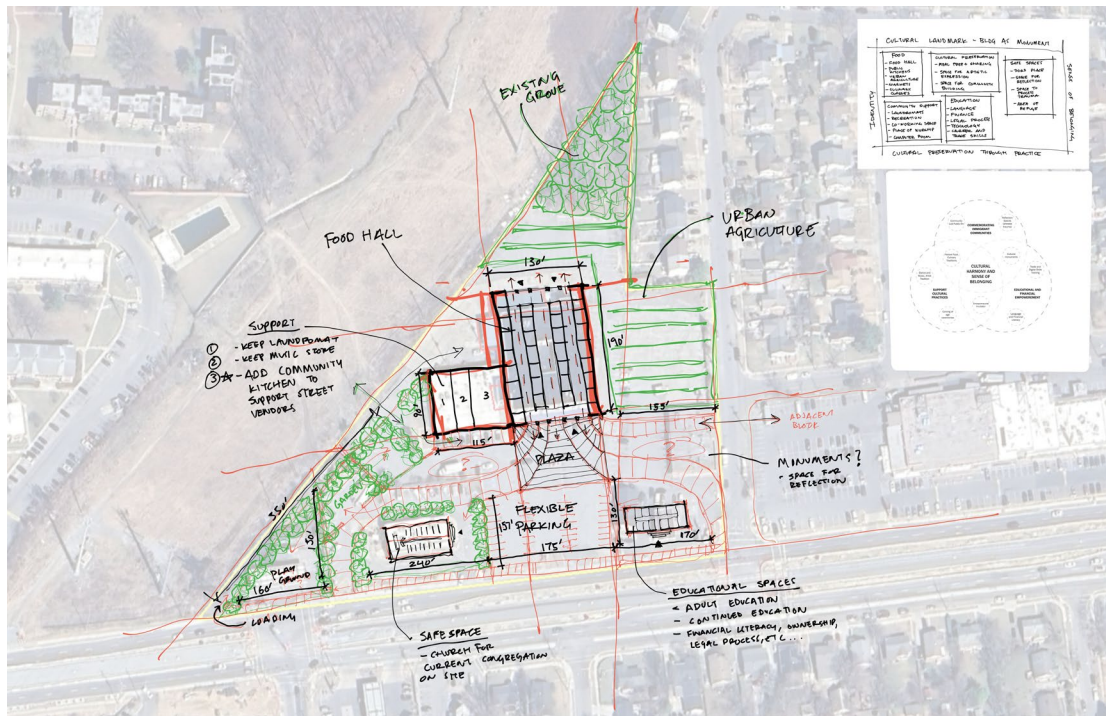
Conceptual Plan 1 Testing of Thesis (developed by author)
